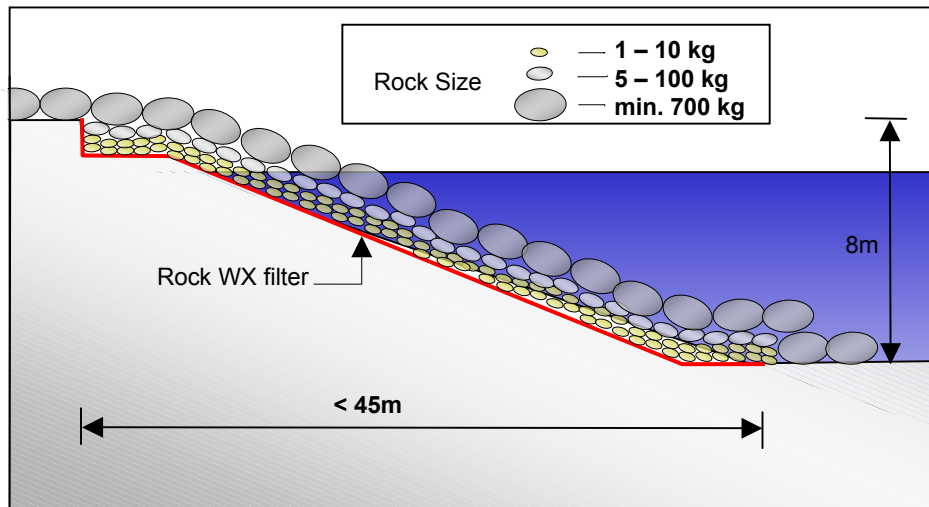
Typical cross sectioned of armour rock protection system with woven knitted geotextile filter.
